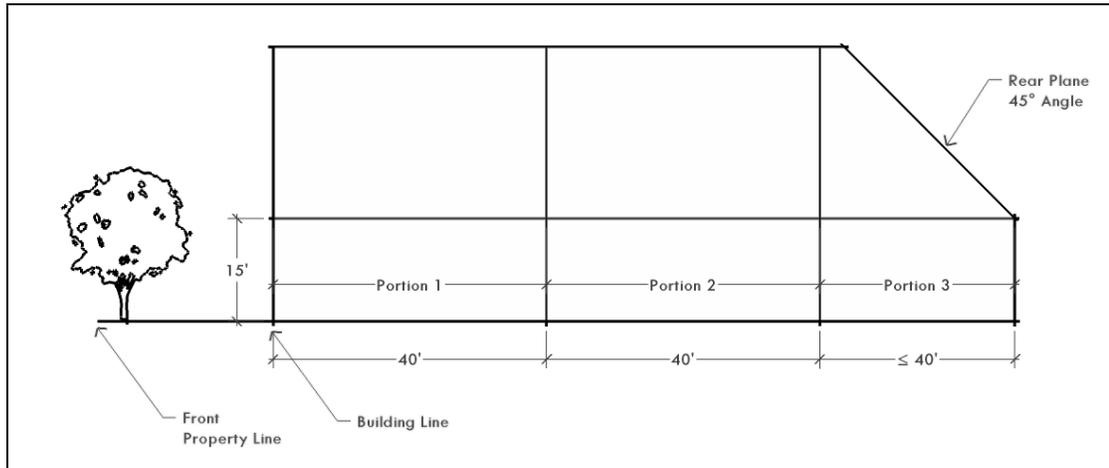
(Elevation View) Rear Setback Plane (Level Ground)
